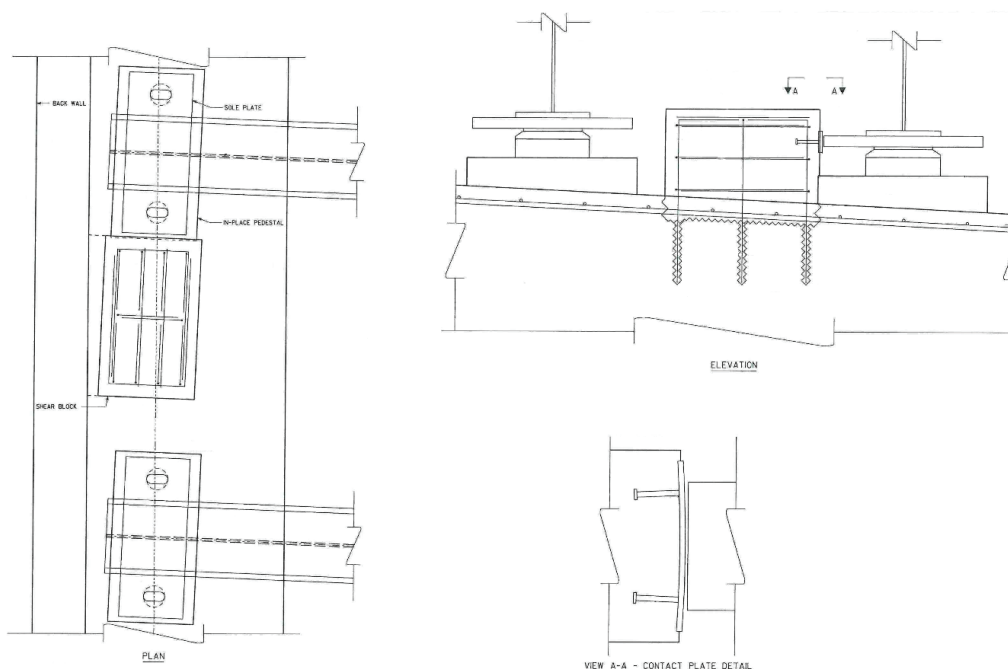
Examples of guide blocks used in lieu of anchor rods
